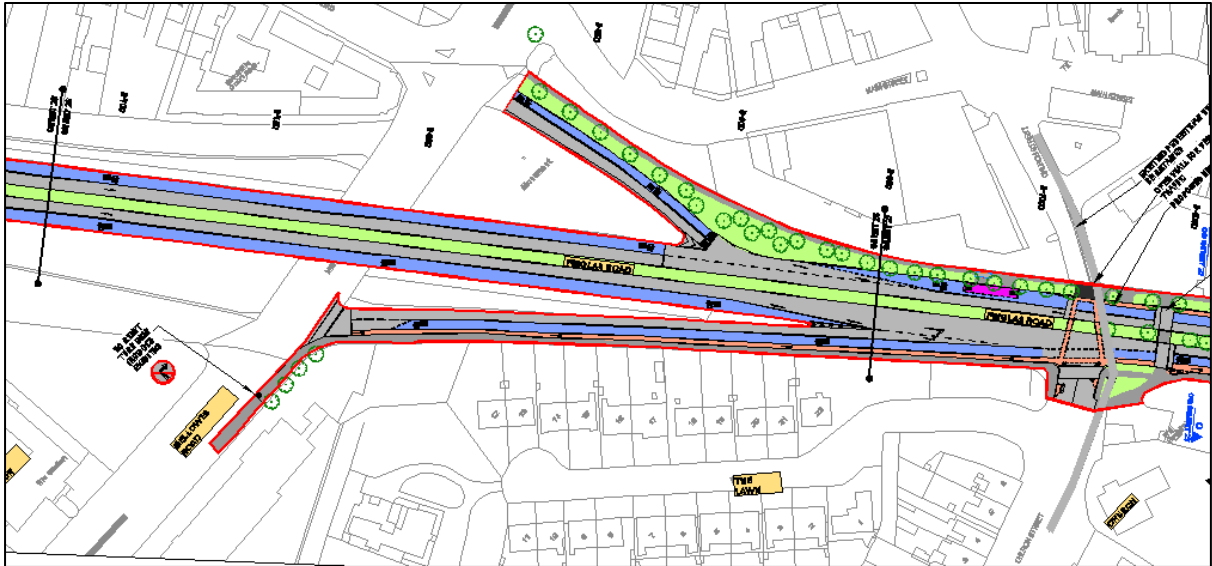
Extract from General Arrangement Drawing Sheet 25
